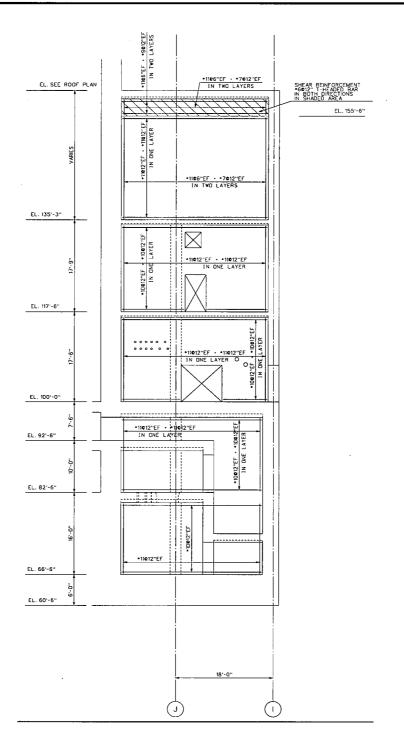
Typical Reinforcement in Wall on Column Line 1
